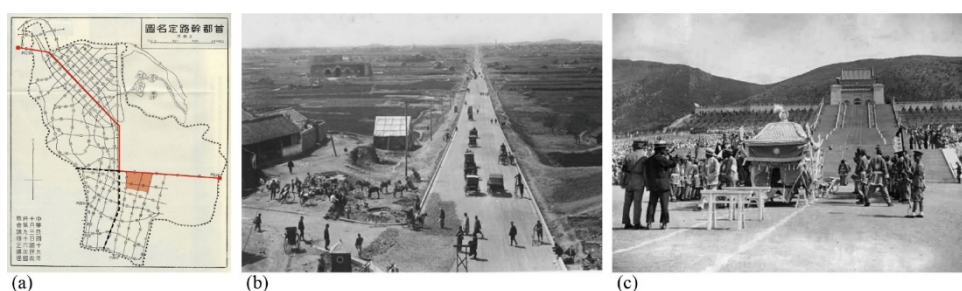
Zhong-shan Road built in Nanjing Decade (1927-37): (a) the Main Streets' Named Map in the City Plan of Nanjing, the red line is Zhong-shan Road; (b) the construction site of Zhong-shan Road in 1928; (c) the Grand Funeral of Sun Yat-sen in 1929.
